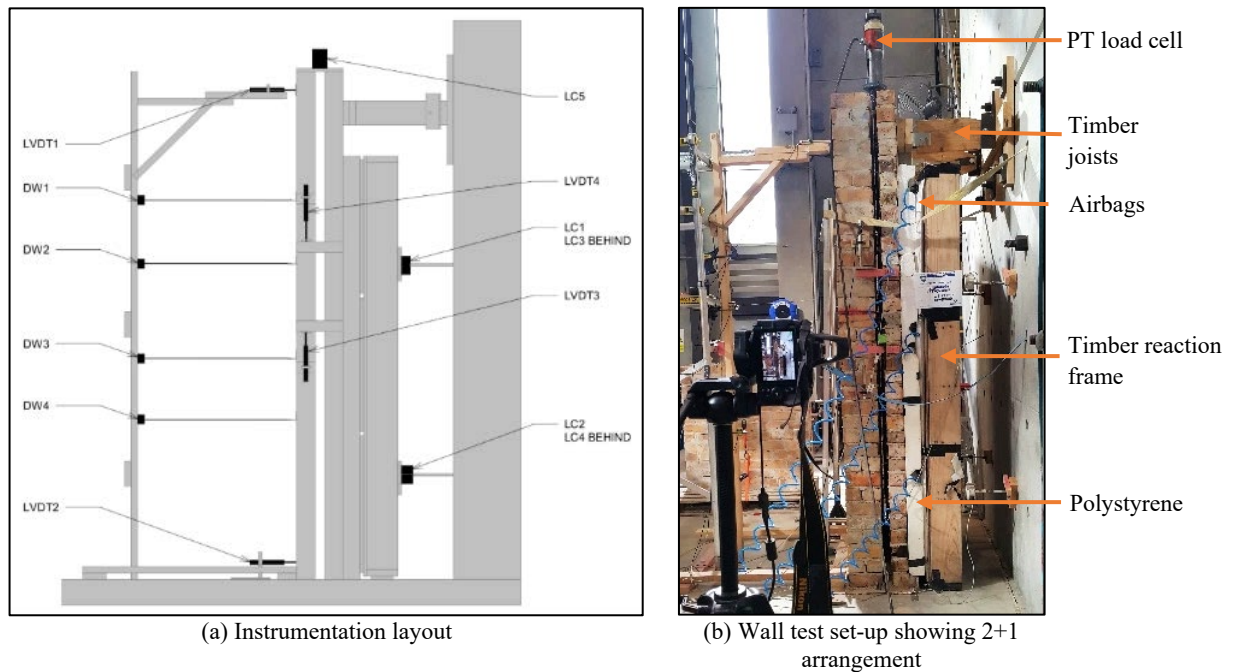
Instrumentation layout and test set-up for semi-cyclic testing
